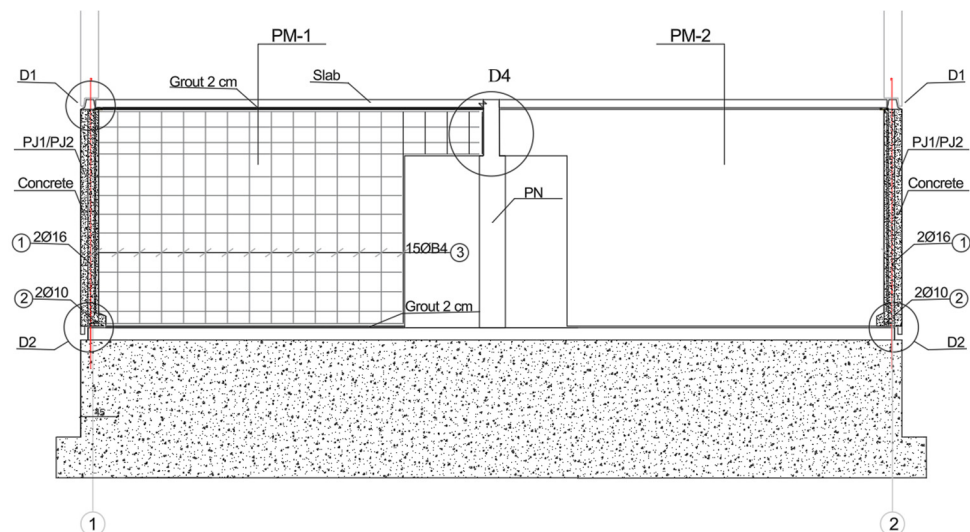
Elevation of precast RC wall panels (PM-1 and PM-2), showing vertical joints, the reinforcement layout, and panel connections.
